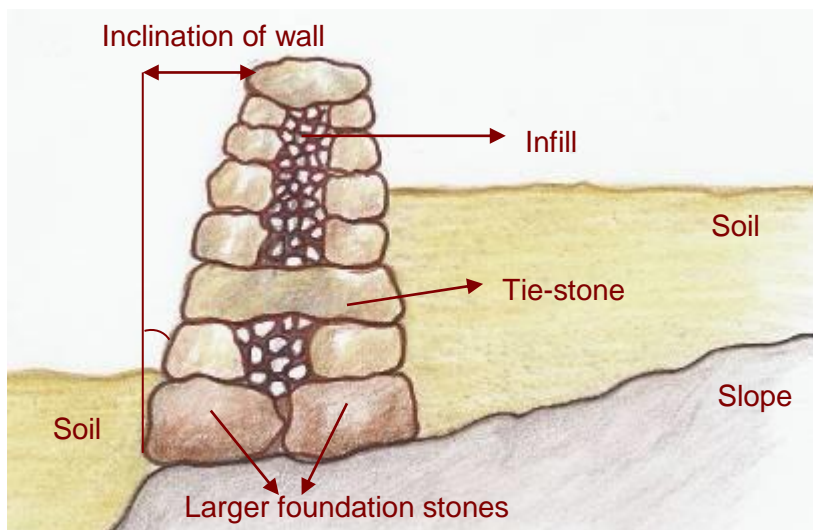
Schematic diagram of rubble wall construction to obtain terracing.
